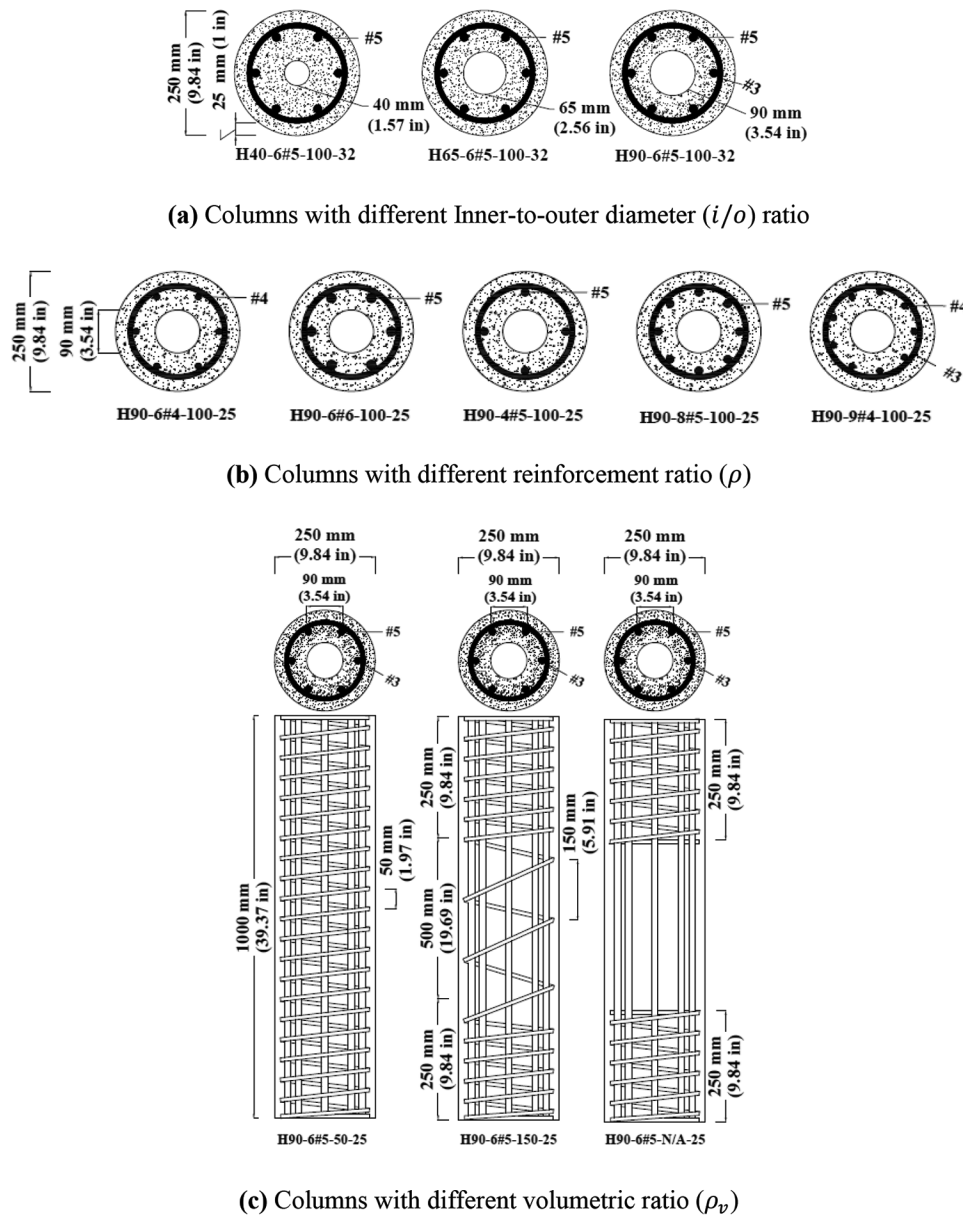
Details of tested GFRP-reinforced hollow concrete columns.
